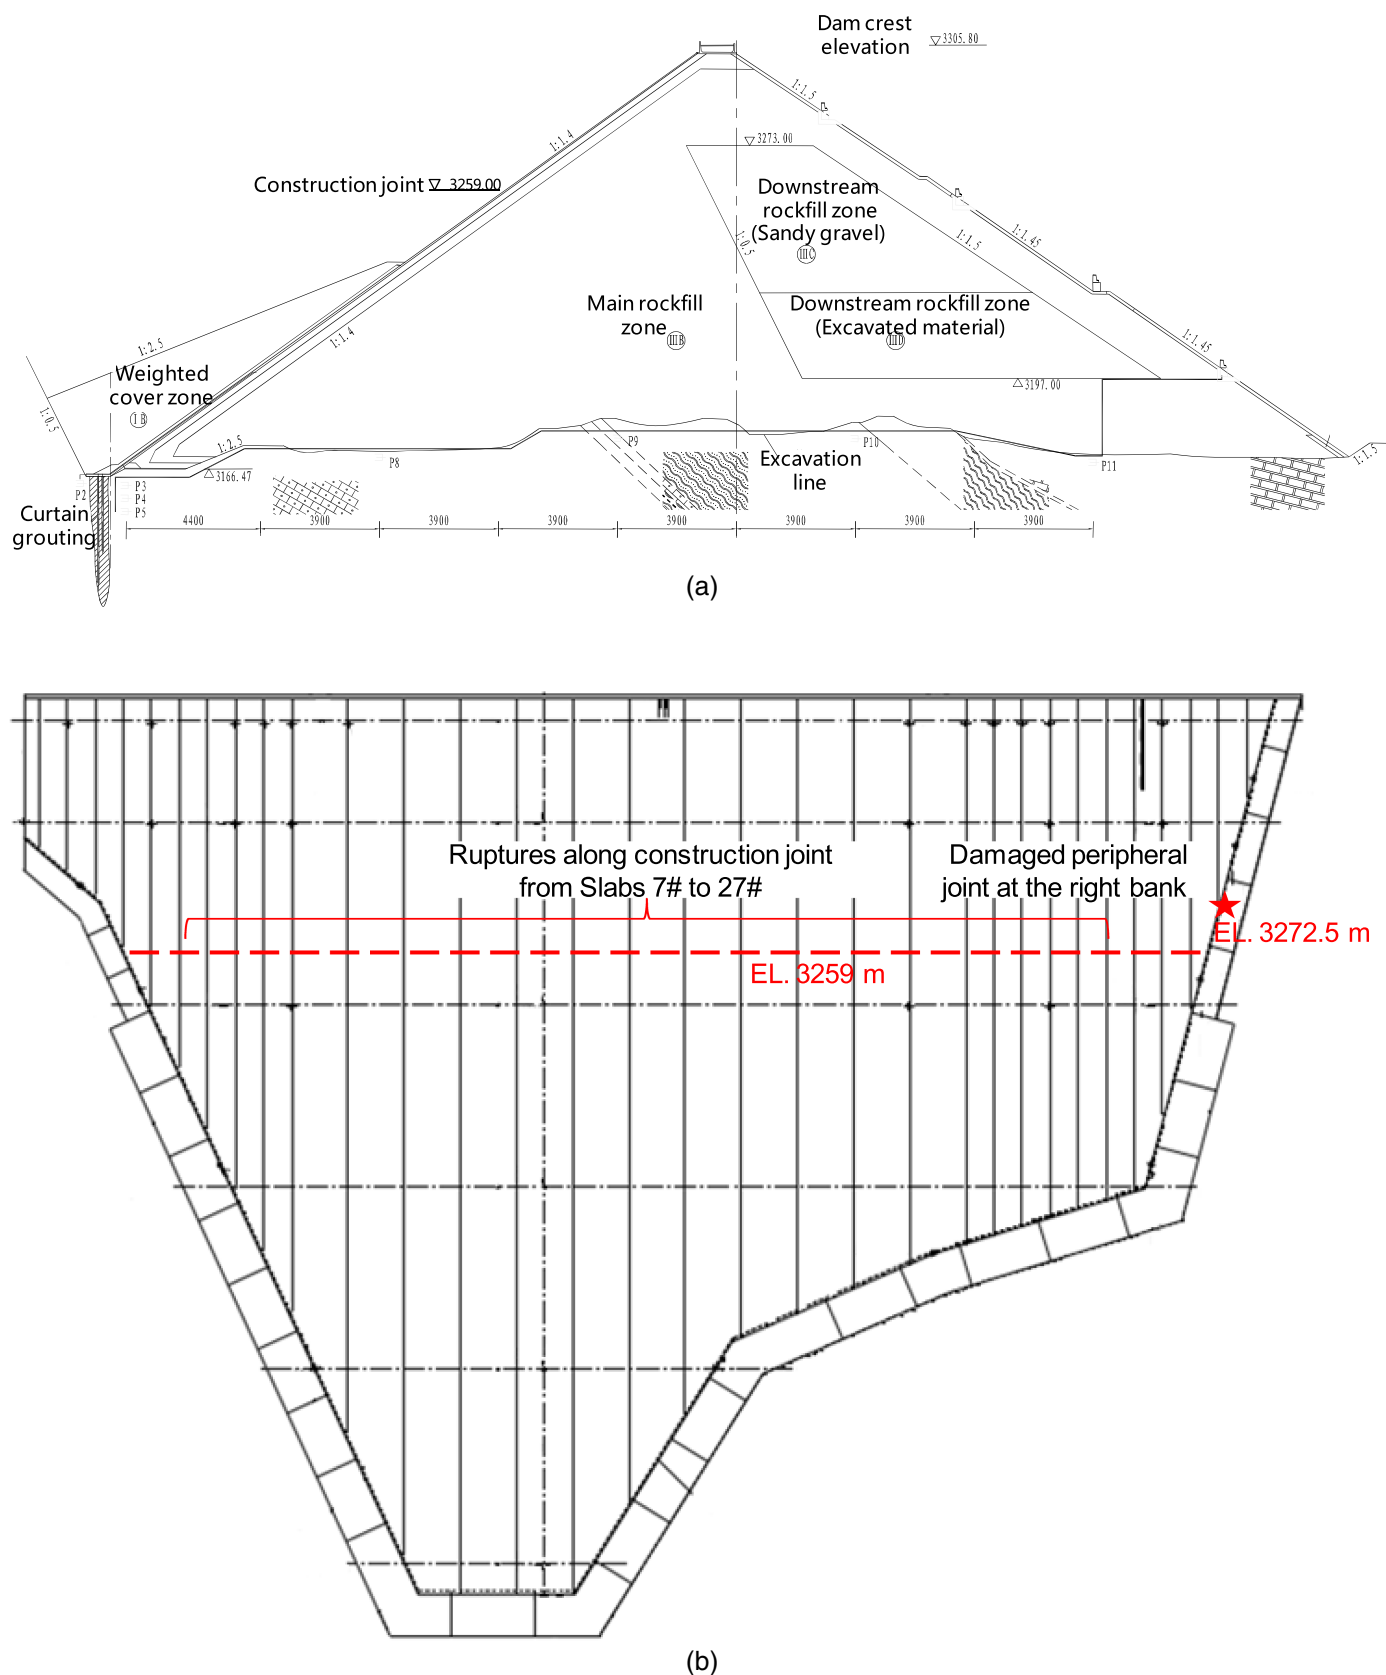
(a) Typical cross section; (b) layout of concrete face slabs of the Buxi dam
